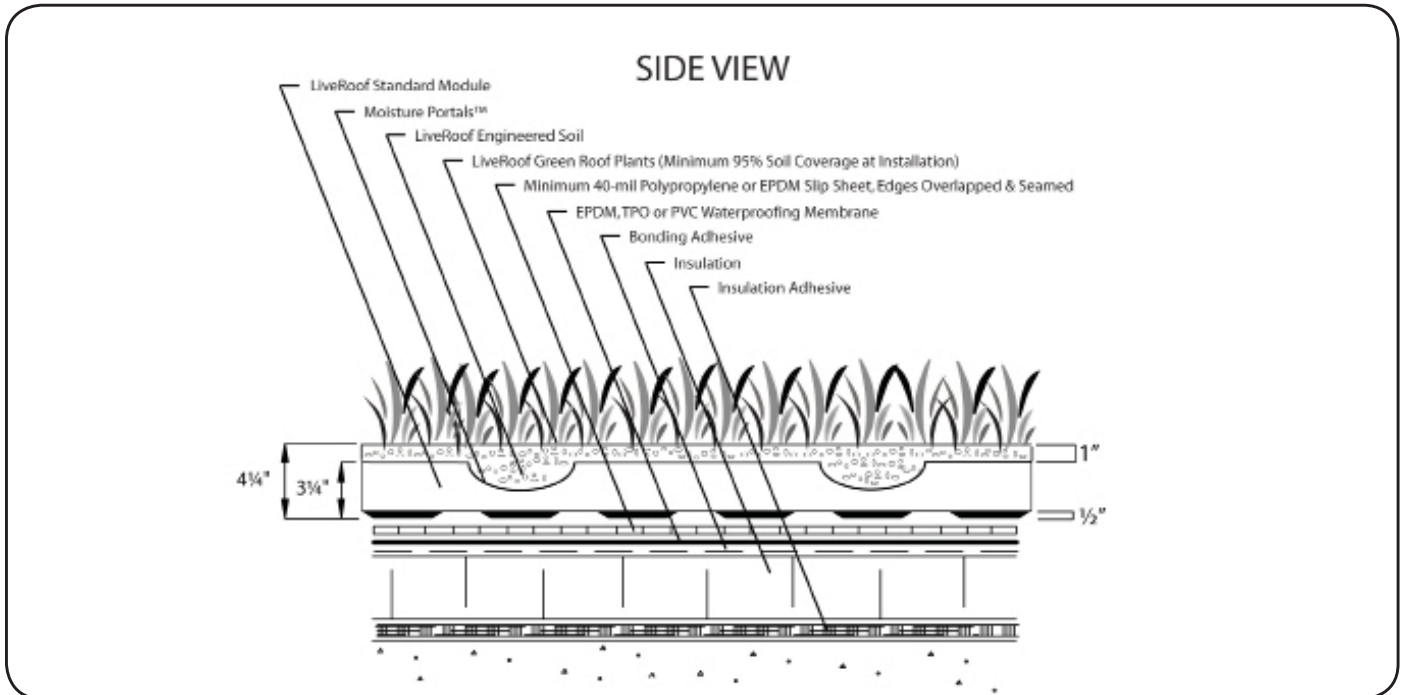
Typical Green Roof Construction Detail (LiveRoof, LLC [www.liveroof.com](http://www.liveroof.com))
